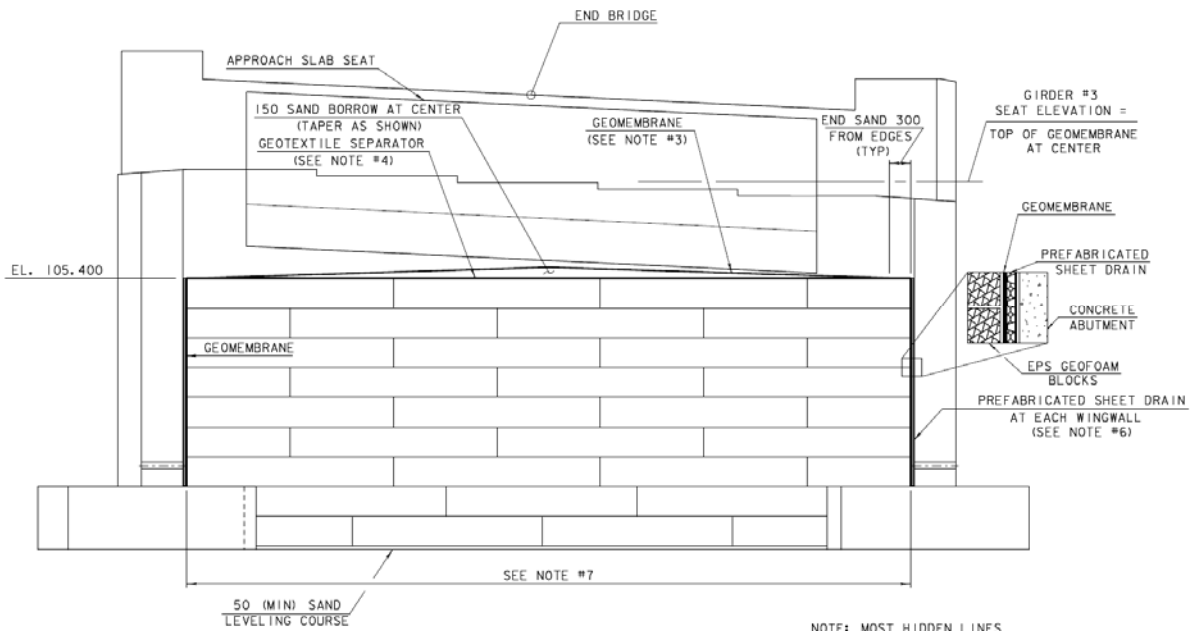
Typical Abutment Cross-Section (Facing Back Abutment Along Centerline).
